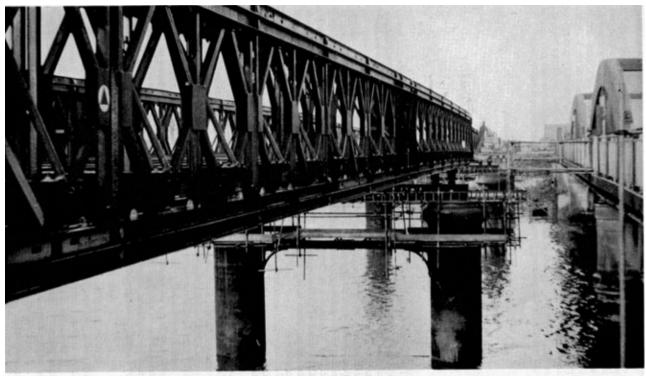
The bridge during launching. The scaffolding off the Cut Bridge enable concrete and roller assembles to be carried on to the piers.
